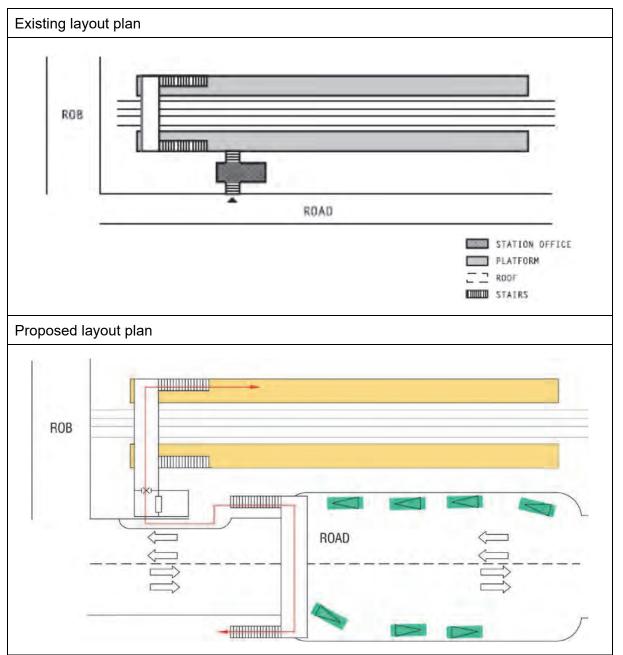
Existing and Proposed Layout Plan (KyeeMyinDaing Station)
